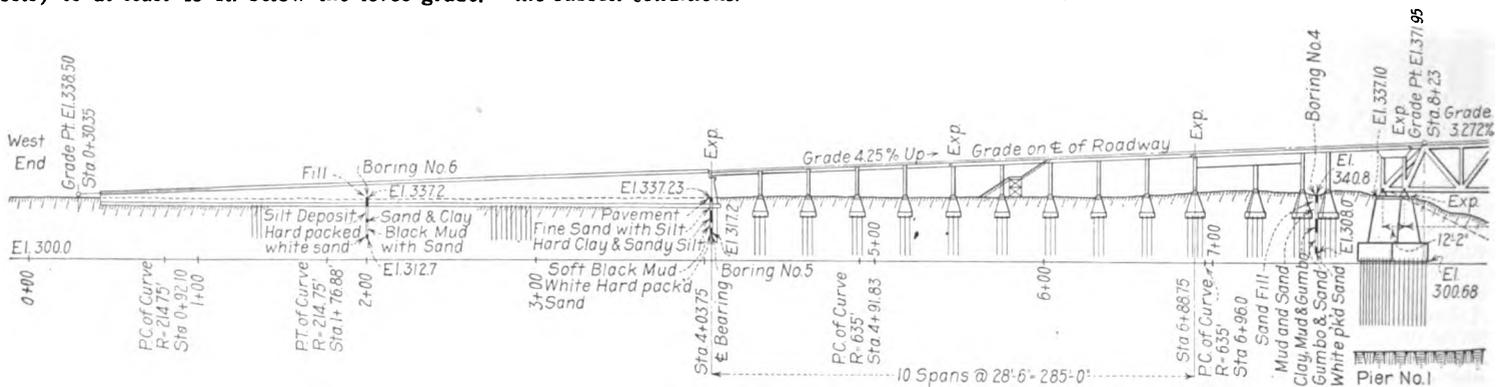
General Elevation of East Kansas Ave. Bridge, Kansas City, Kan.
